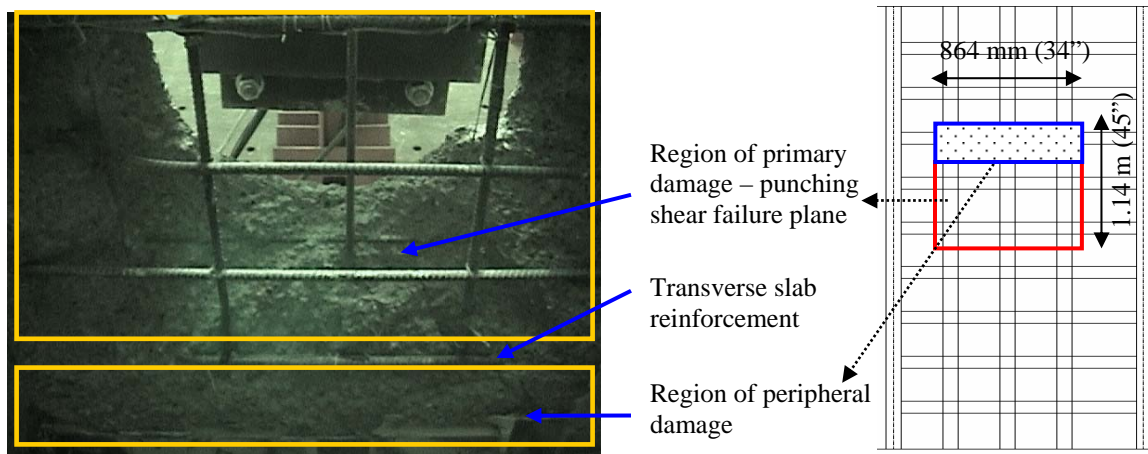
Damage regions in slab 1 after removal of cracked concrete
